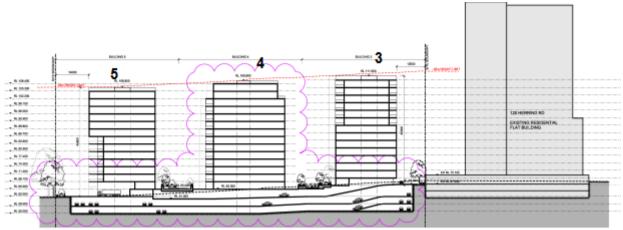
Section illustrating Buildings 3, 4 & 5 height limits.
